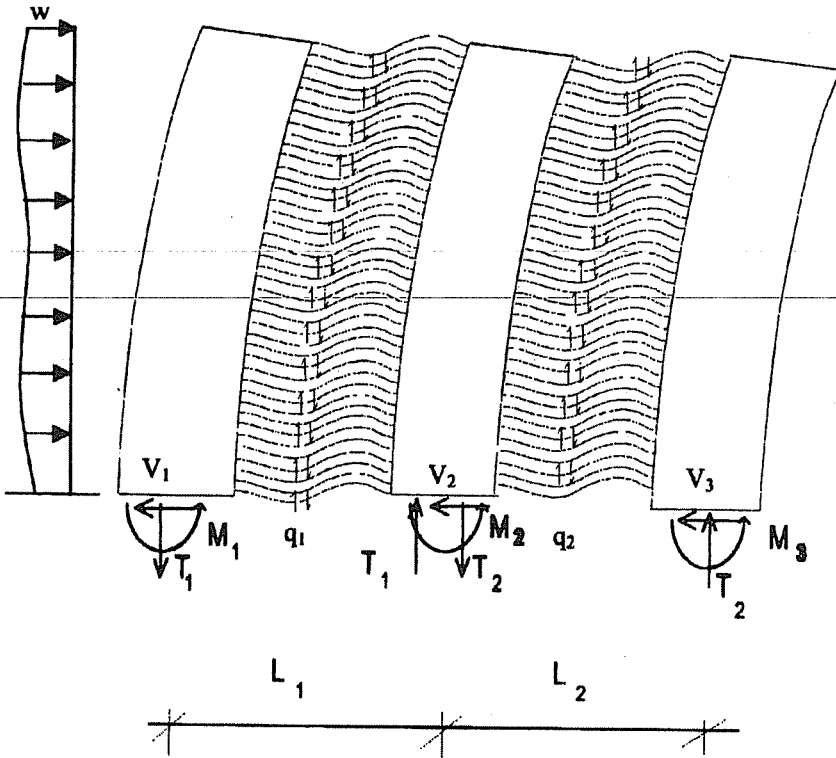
The behaviour of a two-bay coupled shear wall under horizontal loads.
